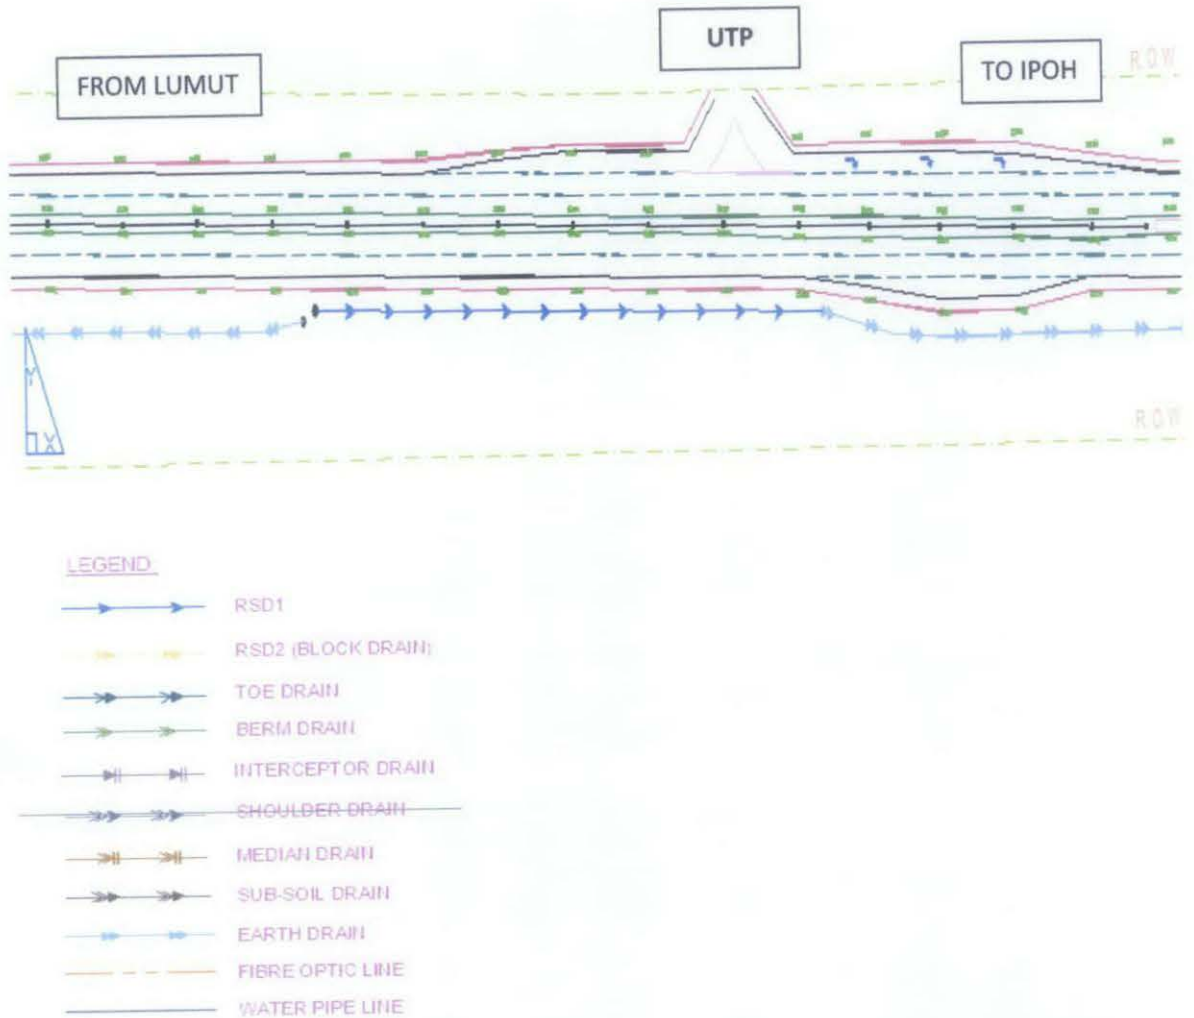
The Road Plan for Ipoh – Lumut Highway with the existing drainage
